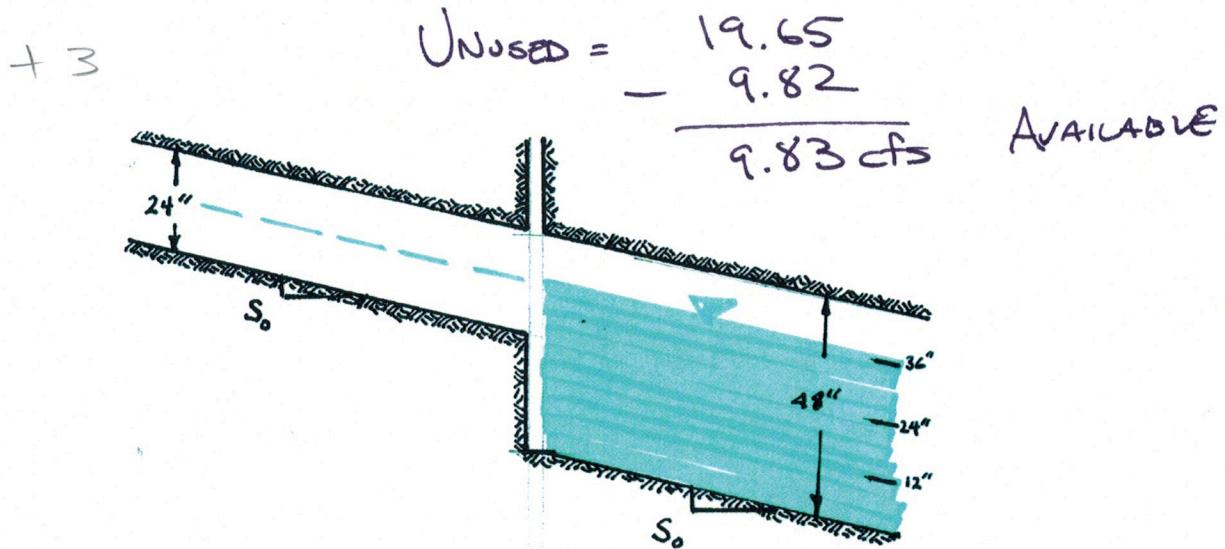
Sewer pipes connected at a junction box. Matching soffit elevations.
